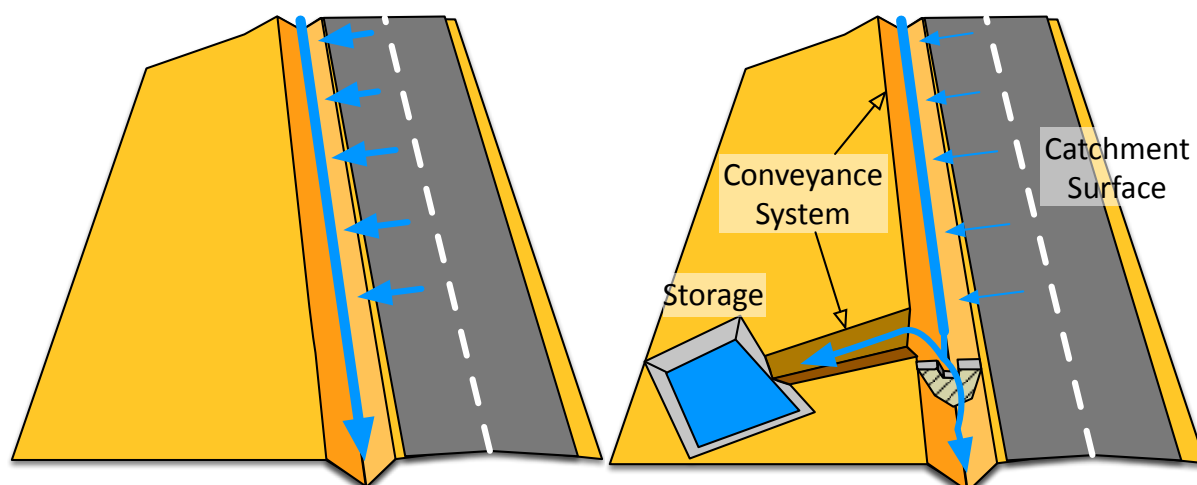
A road with drainage ditch (Figure developed by Francesco Sambalino)
